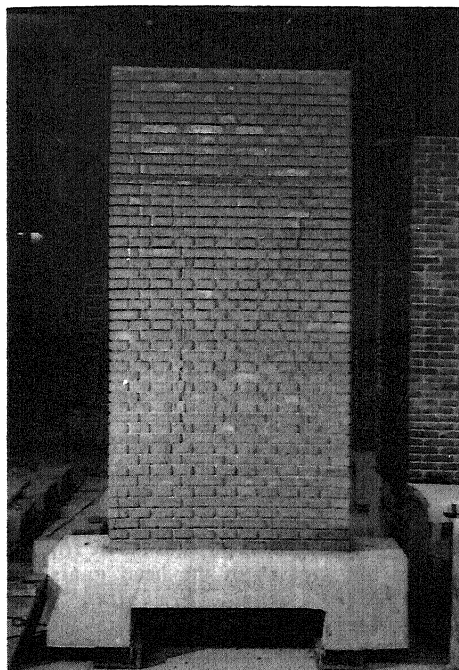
Wall MI3 at the end of the test: tensile failure of bricks.
